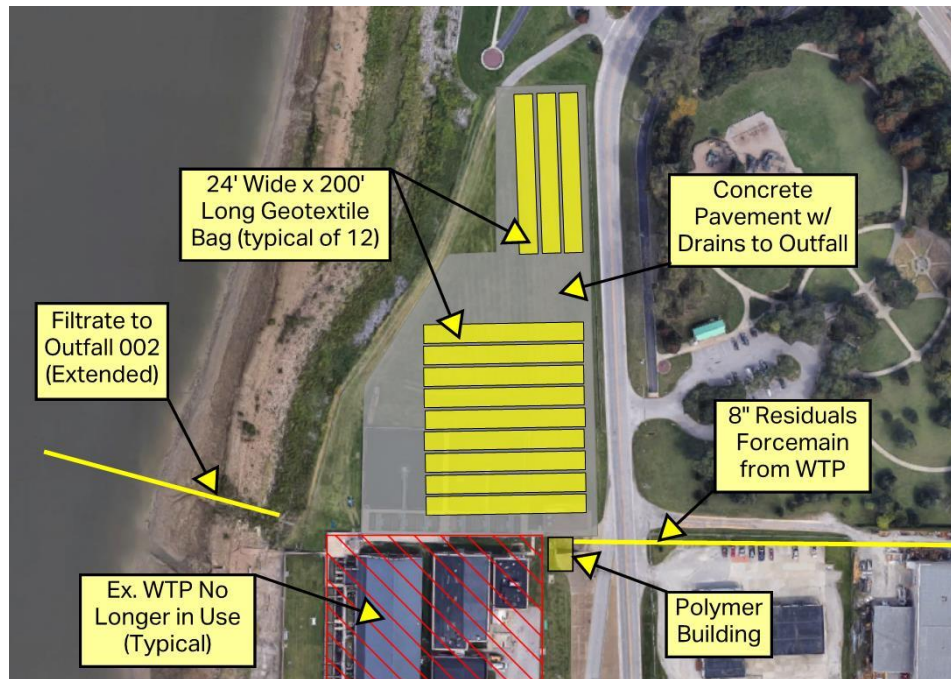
Conceptual Layout of Dewatering Bag Facility
